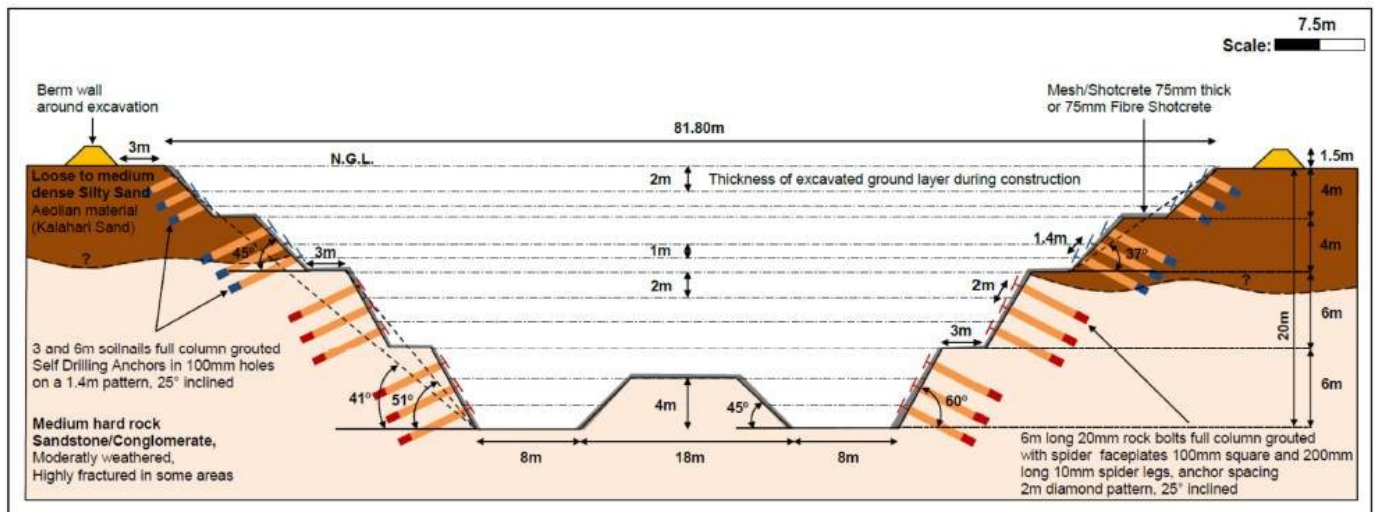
Cross Section of the T-Zone and F-Central Zone Portals
